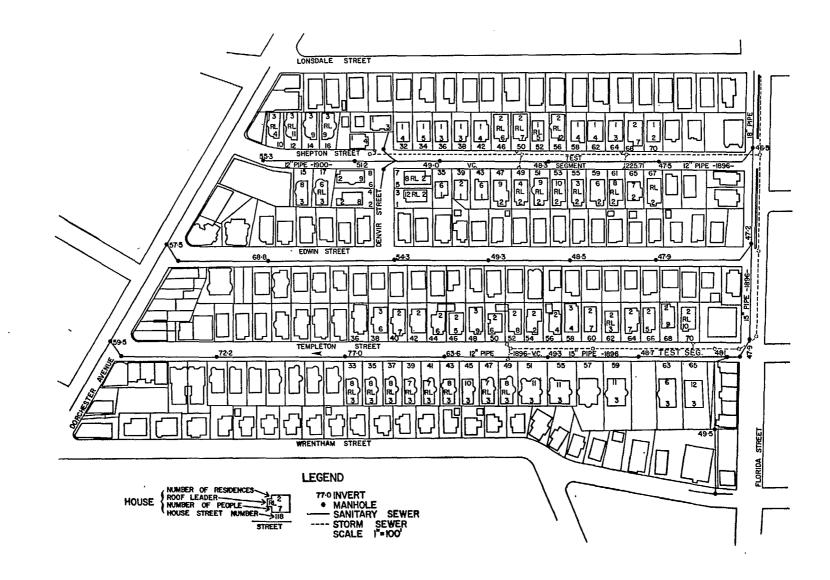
PLAN MAP OF SEWER FLUSHING TEST SEGMENTS SHEPTON & TEMPLETON STREETS
